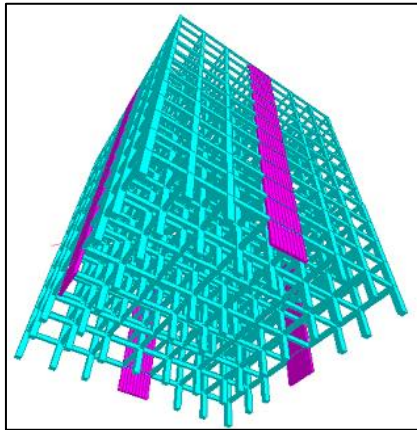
3D view of building with floating column at 2nd intermediate position of columns and shear wall at 4 sides of the building
